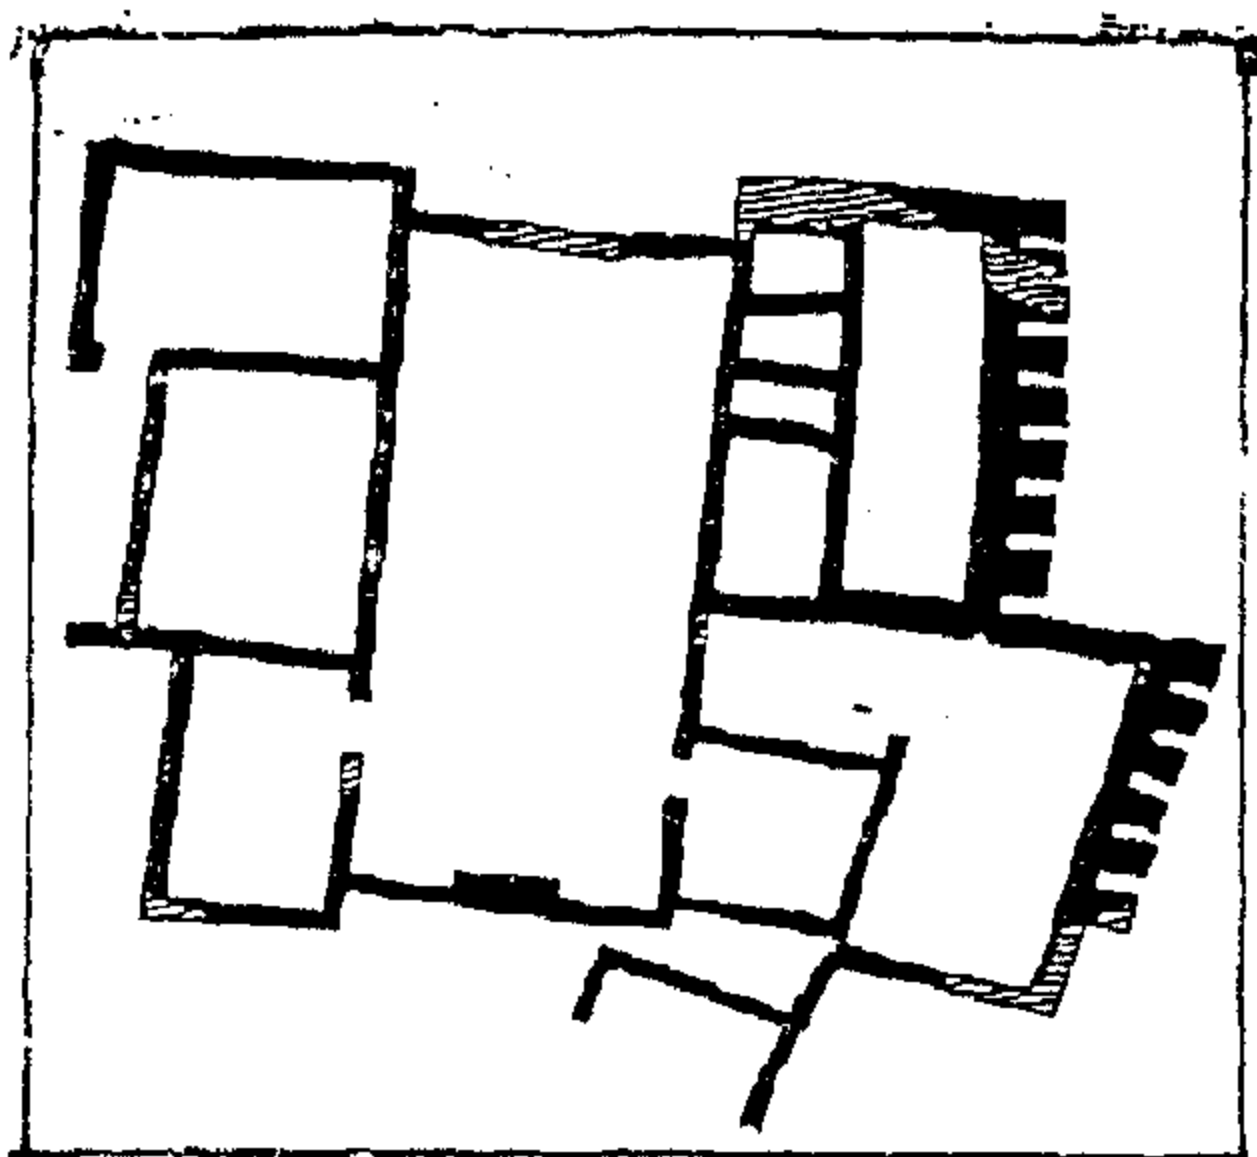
Plan of House at Tell 2, Telul el - Thalathat (after Egami 1959, Fig. 25 on pp. 88 -89).
